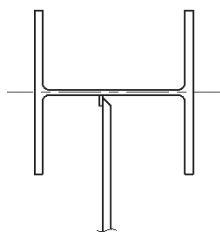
Complete-joint-penetration weld with access problems.
